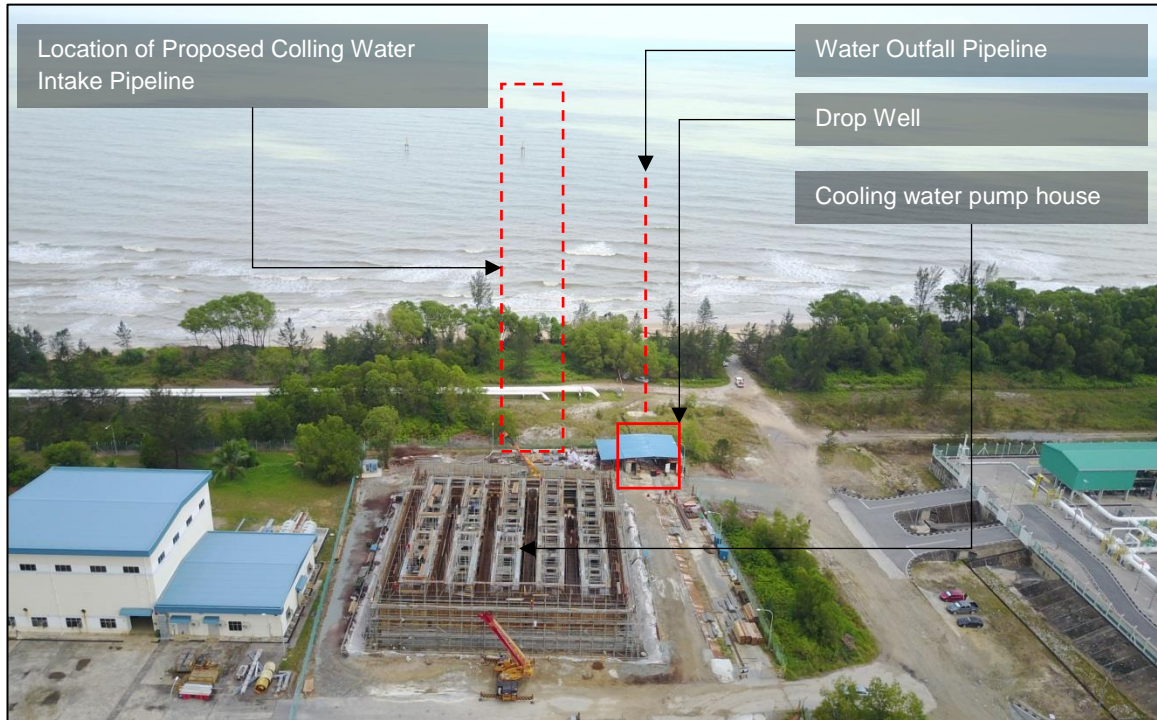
Location of cooling water pump house and proposed cooling water intake pipeline (source: Sinohydro)
